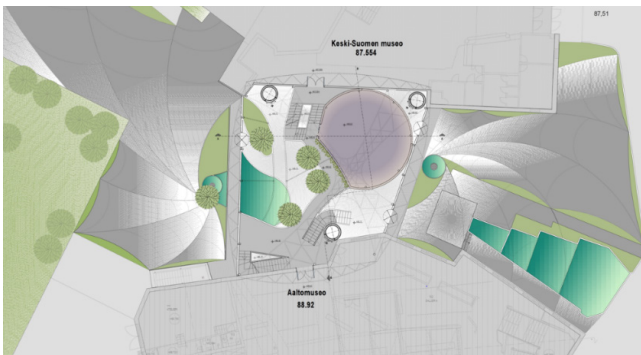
Second floor plan; (on a level + 87.554 / + 88.92)
